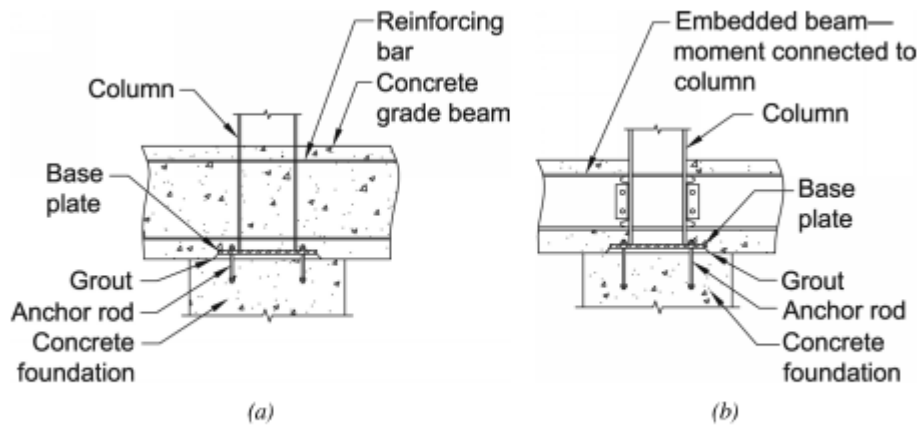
Examples of column base fixity in a grade beam.
